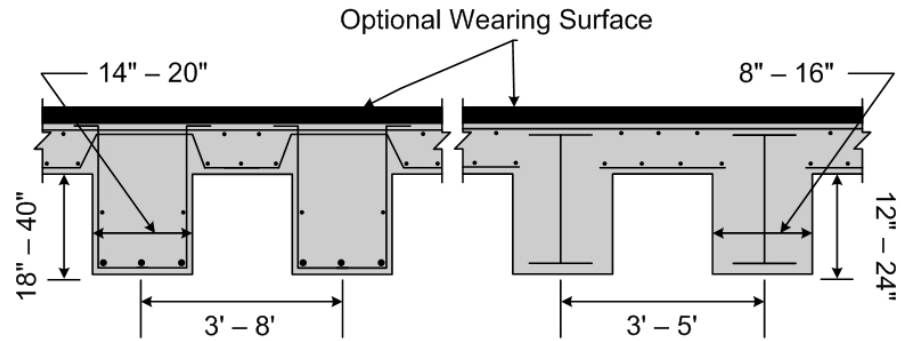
Comparison Between Tee Beam and Concrete Encased Steel I-beam
